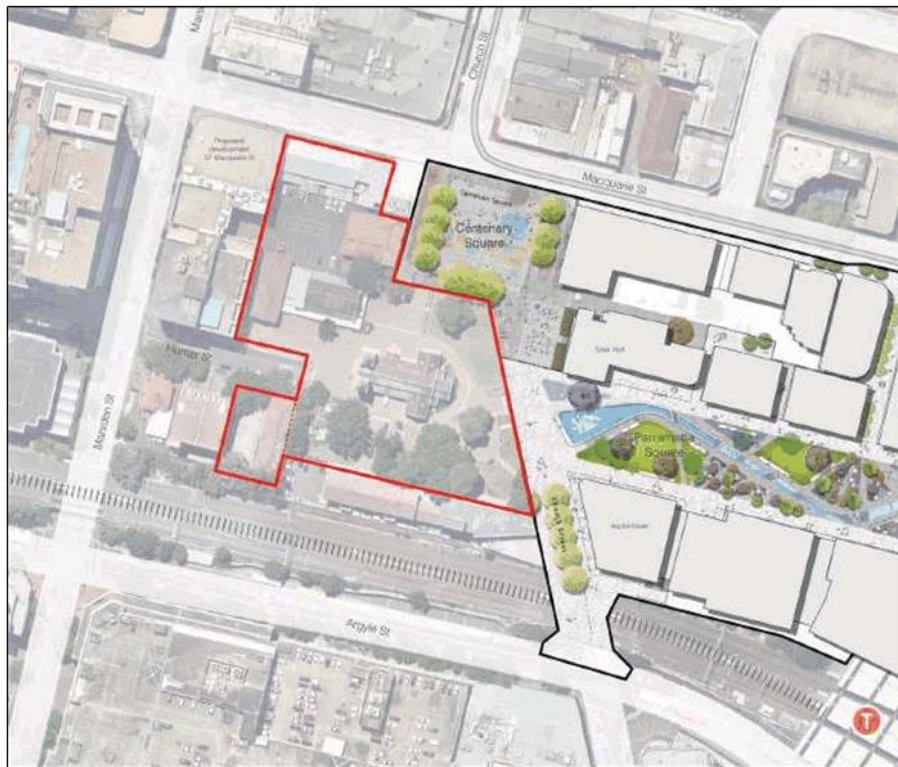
Illustration of Site Area (pg. 9, Applicant's Urban Design Report)
